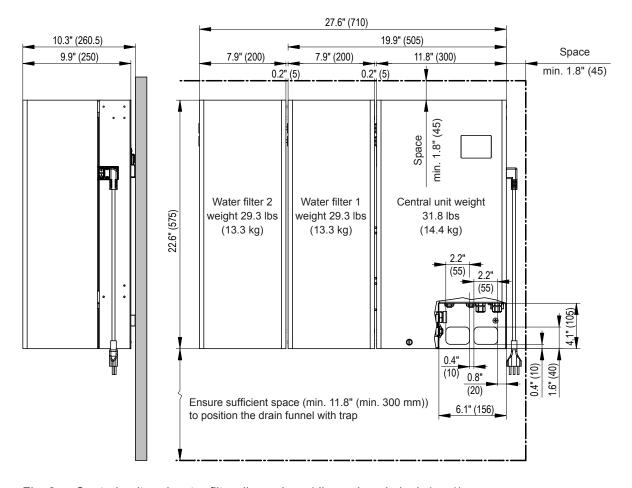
Overview of clearances to be observed (dimensions in inch (mm))
